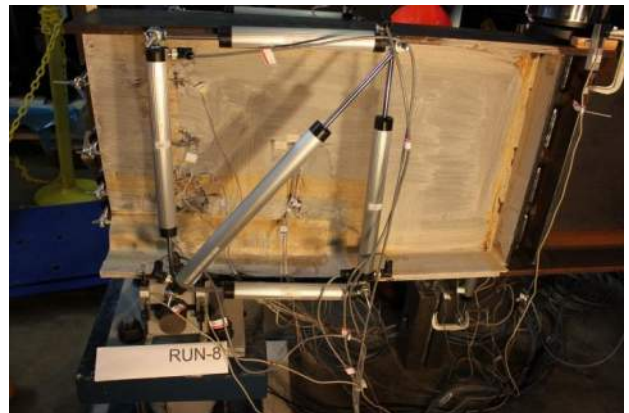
Damaged Girder Right: 40 kip
